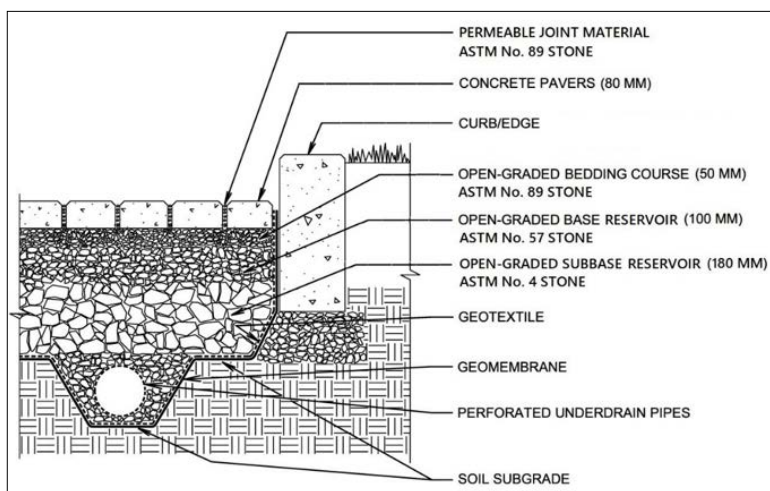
Typical Cross-Section of Structural Design of PICP [40]
